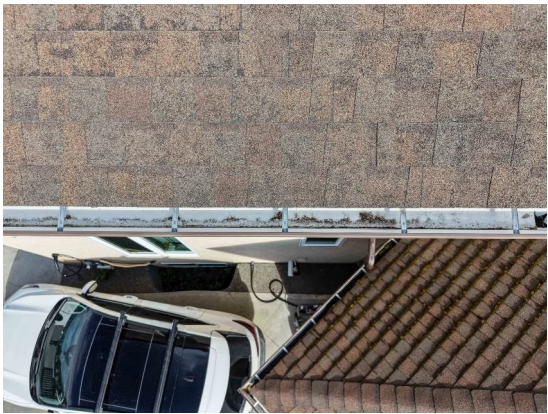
Detail 1 — Drainage / Gutters and Downspouts, South.
